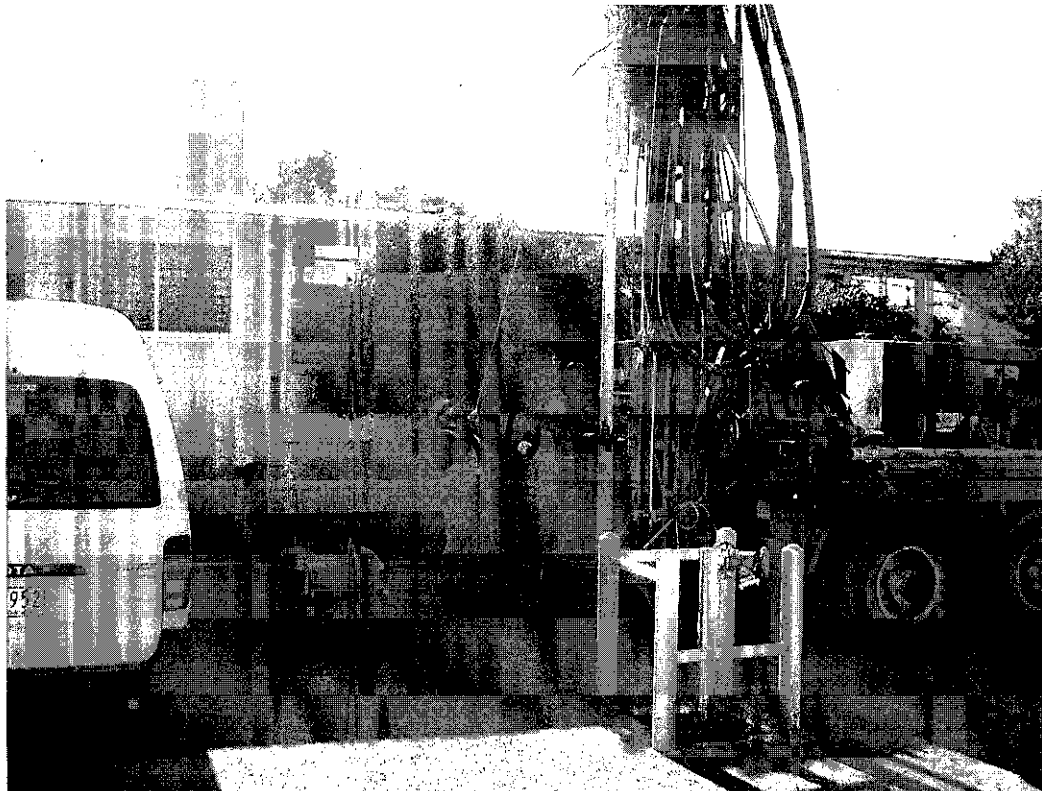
Installation of monitoring well MW2, view from south to north. Note fire hydrant in foreground.
